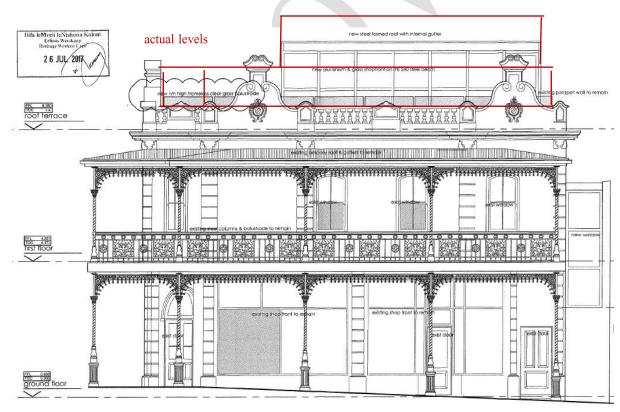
Weltevreden Street Elevation – from approved drawing of 2017 by Zollner Architects.
